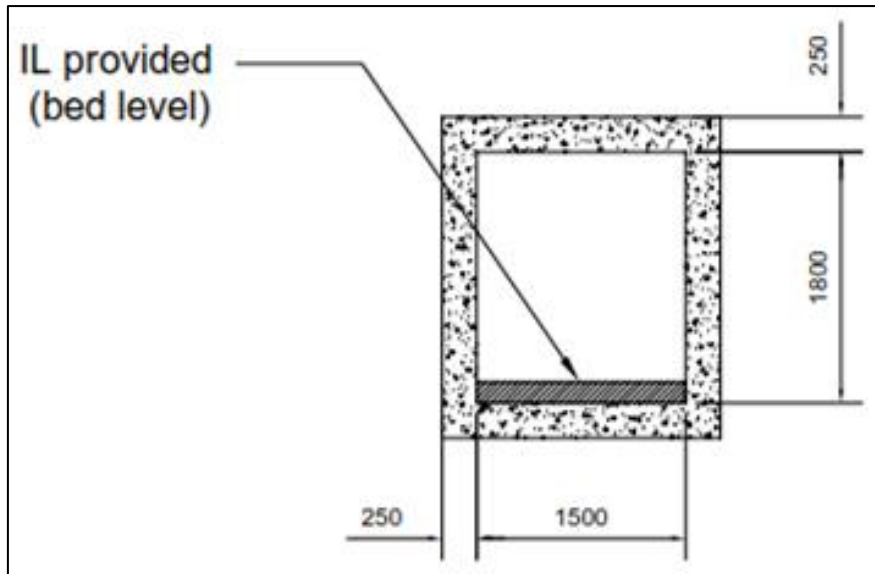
Rockham Ditch Proposed Kelpie Marina Access Road and A1 Culvert (dimensions not to scale)
